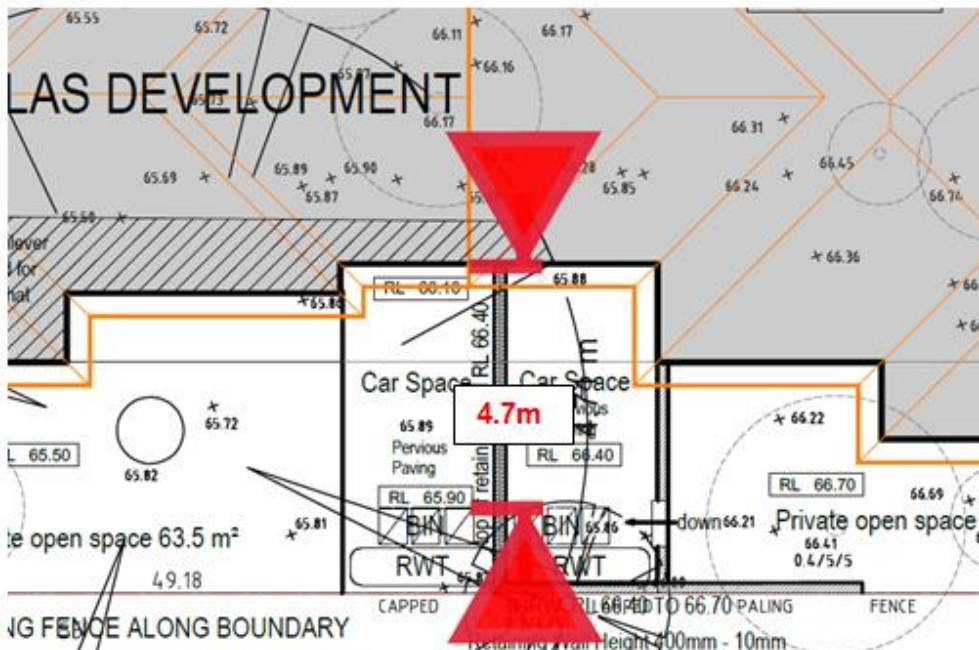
Length of tandem parking space accounting for bin storage and rainwater tank
